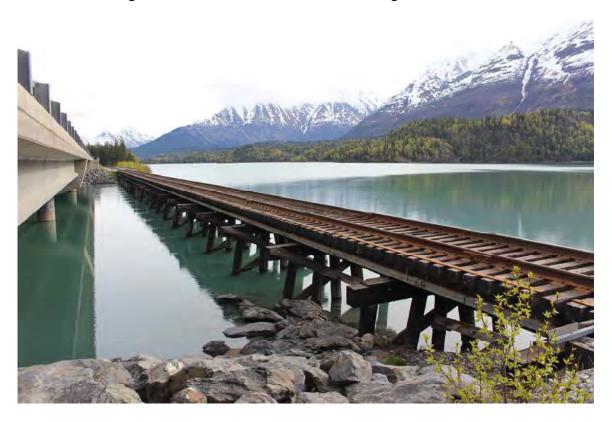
Looking north from the southwest corner of Bridge 25.7, Trail Lake.
